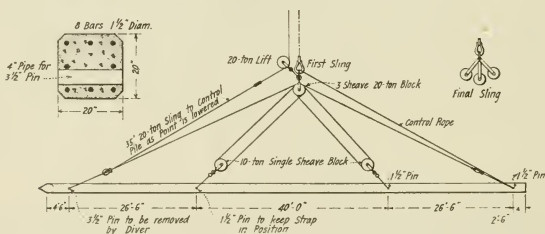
METHOD OF SLINGING 100-FOOT CONCRETE PILES USED AT AUCKLAND, NEW ZEALAND.
